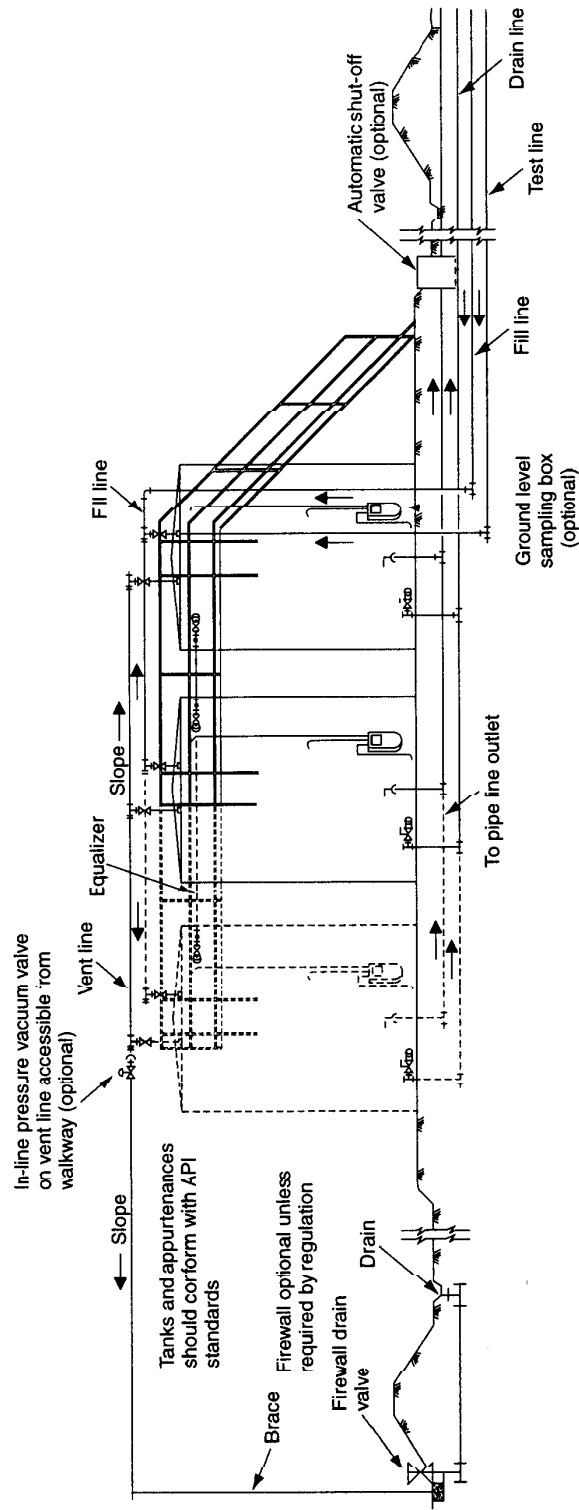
Example of Straight Line Tank Battery Installation and Piping Configurations
